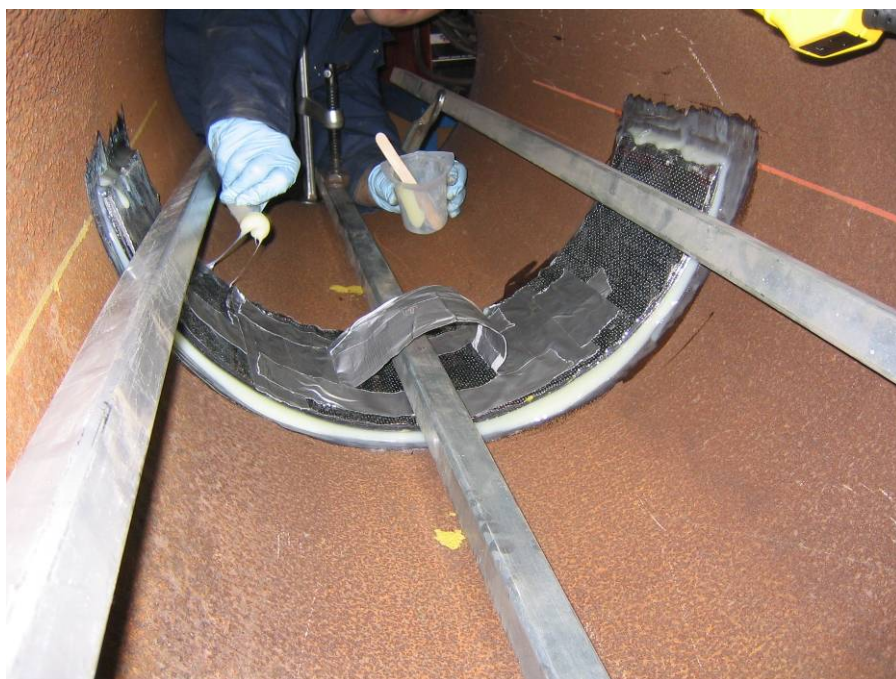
Application of Adhesive to Repair Patch (Design 1)
